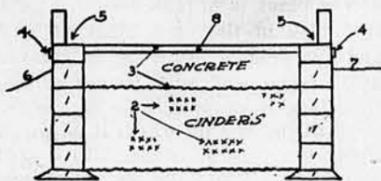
Vertical cross section of one crib, the other to be built in the same manner. 1. Rock wall. 2. Cinders. 3. Concrete floor. 4. Anchor rod nut. 5. "L" sill. 6. Grade line outside. 7. Grade line of driveway. 8. Anchor rod.
